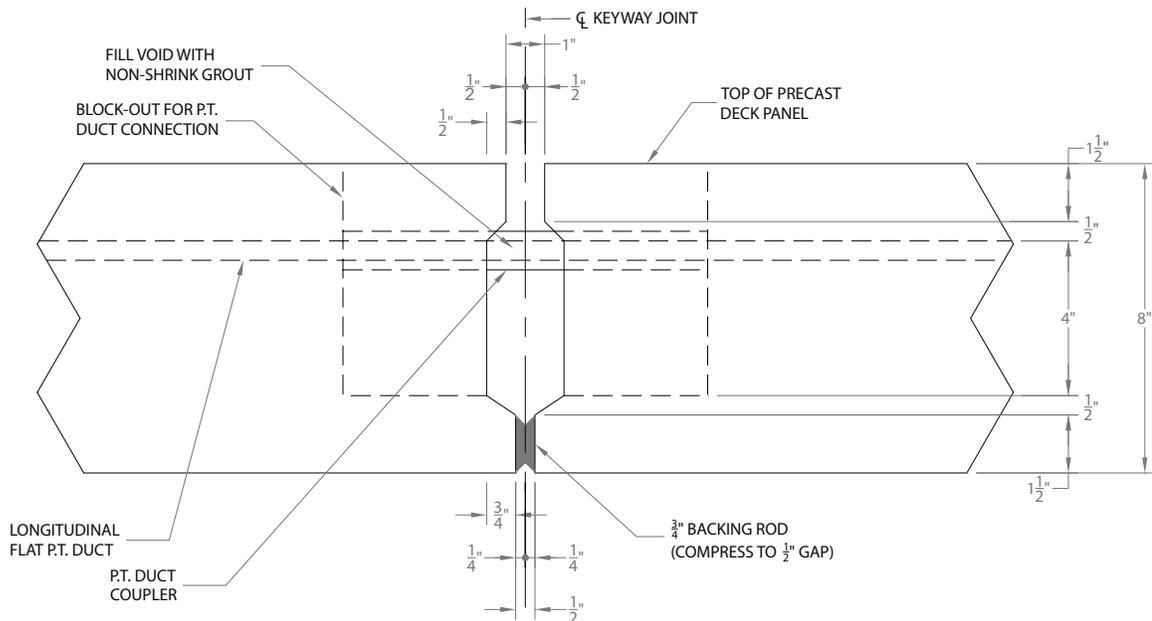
Transverse Joint Detail of the 24<sup>th</sup> Street Bridge.
